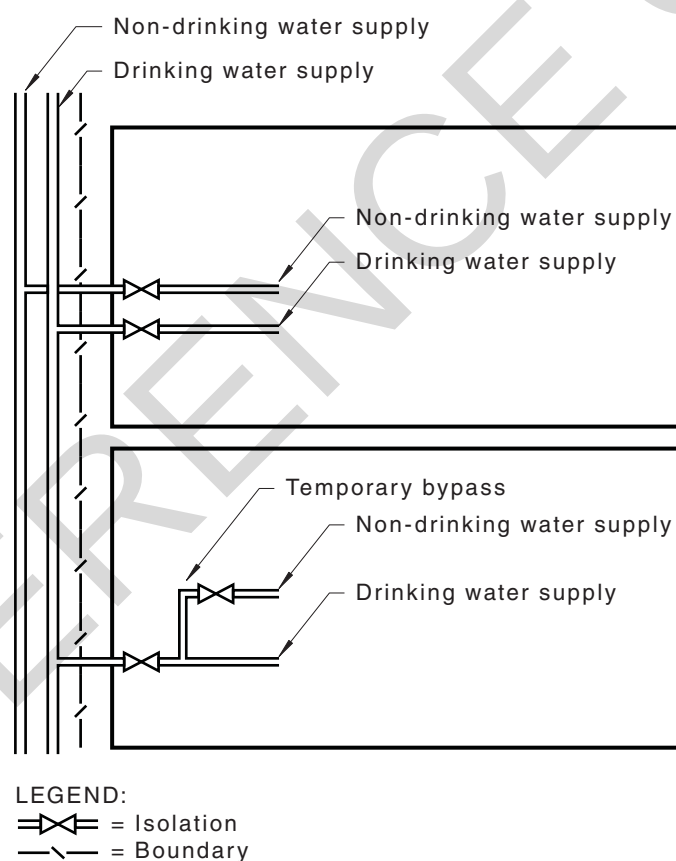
TYPICAL EXAMPLE OF A TEMPORARY NON-DRINKING WATER BYPASS
